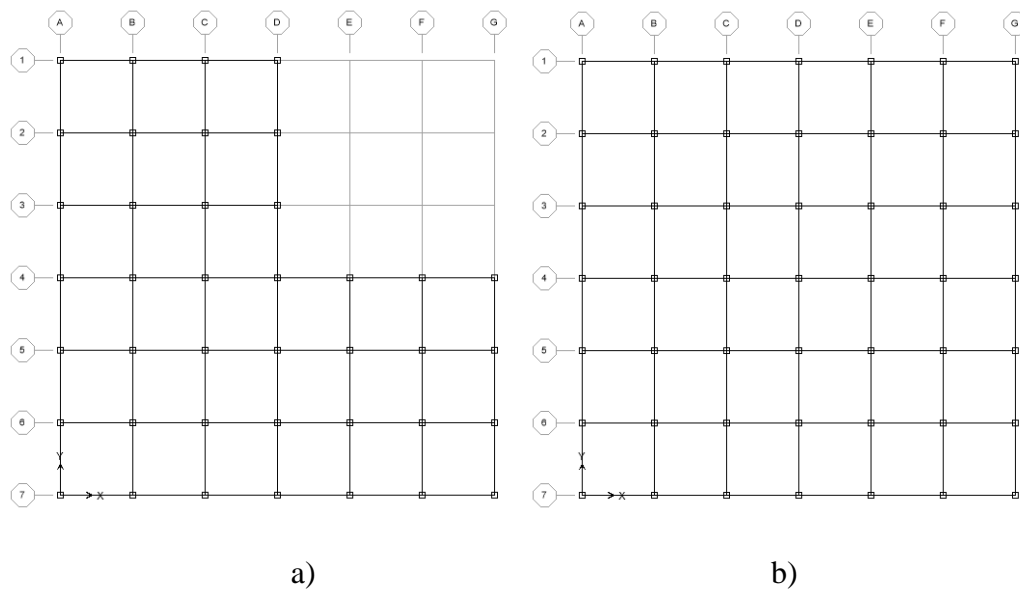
Model structures, (a) Plan of structures 1 and 2, (b) Plan of structures 3 and 4.
